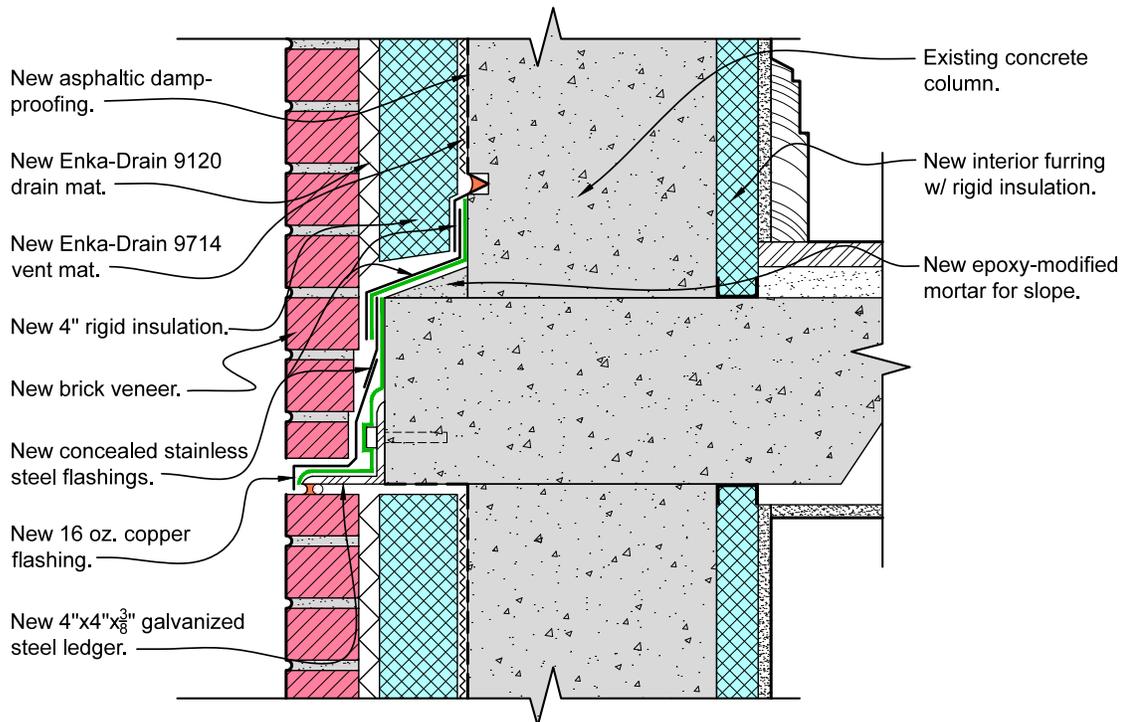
(1): Typical New Brick Veneer Over Existing Concrete Column
